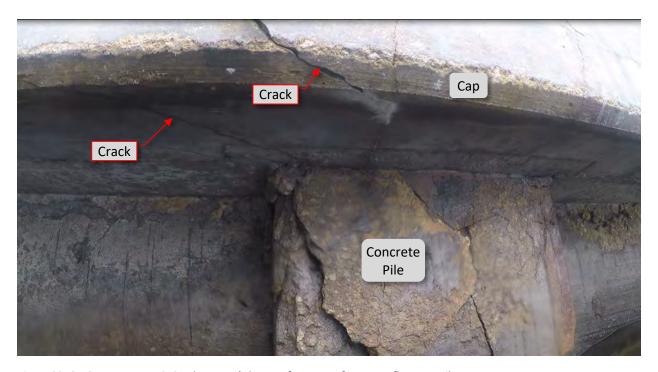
C4. STA 5+11 - 5+16. Cracks on cap's bottom face starts from west flange at pile.
